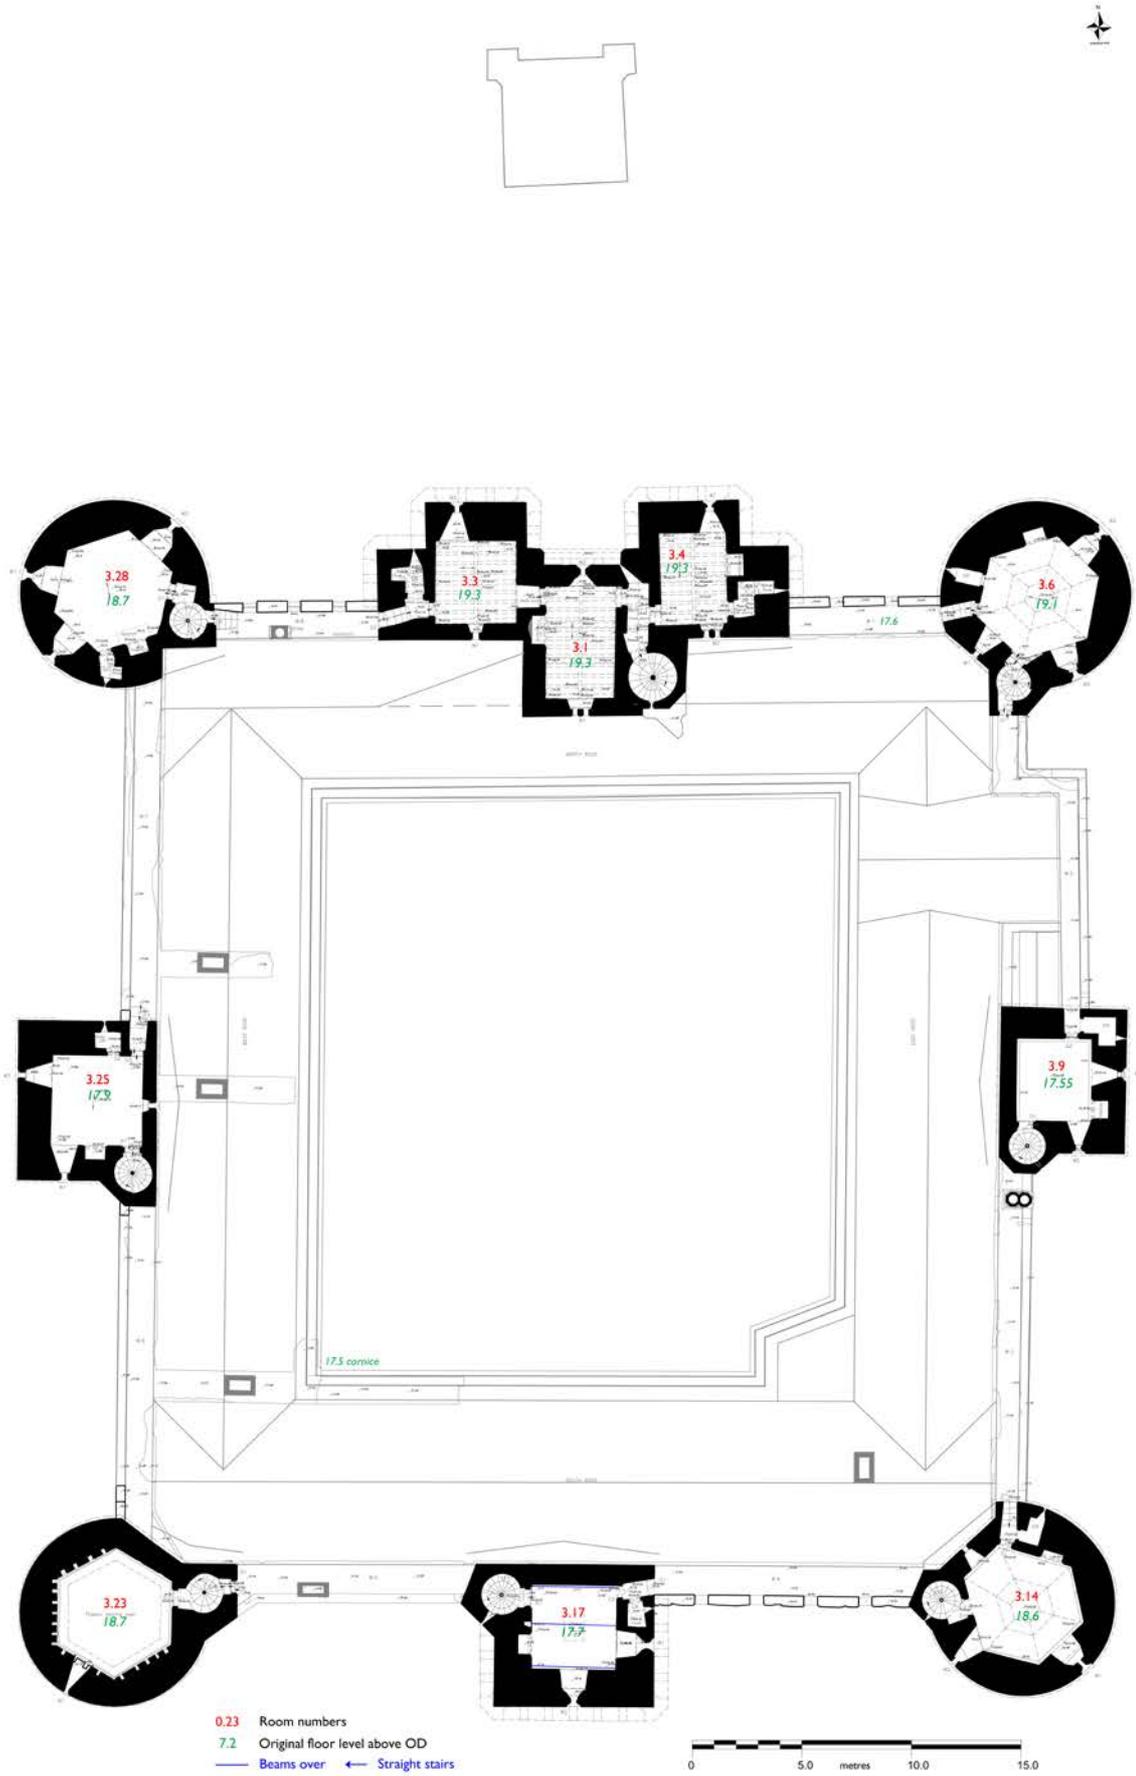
Bodiam Castle Second Floor Plan (based on a survey by James Brennan Associates); reconstructed lines and walls in grey tone
